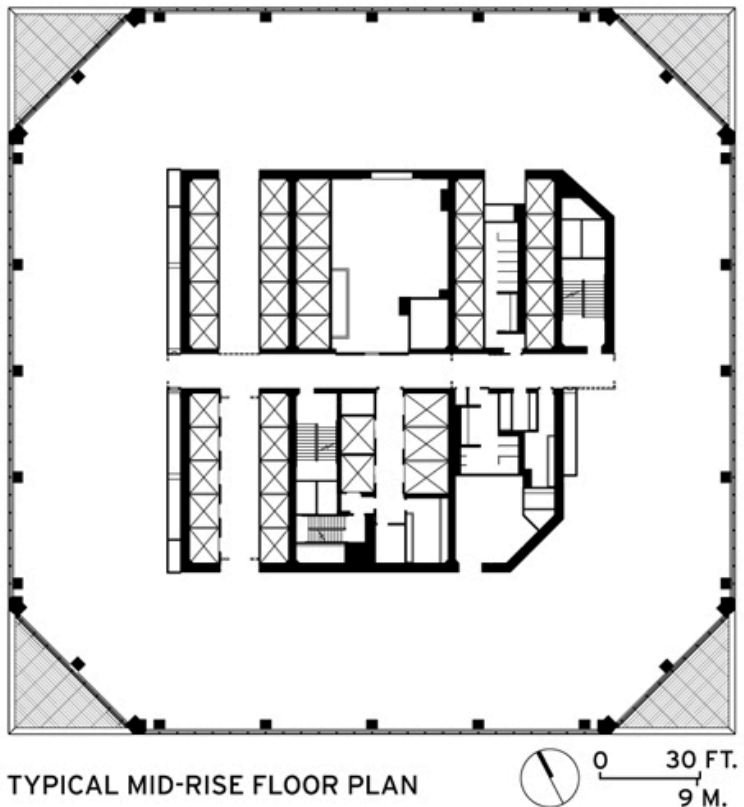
Typical Mid-Rise Floor Plan (OWTC: SOM, 2012)
